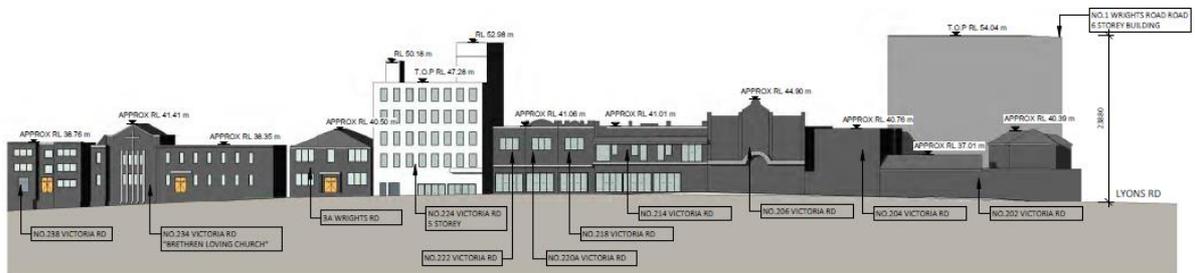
Victoria Road North Eastern Side Elevation (DA-0-305 Rev D)
